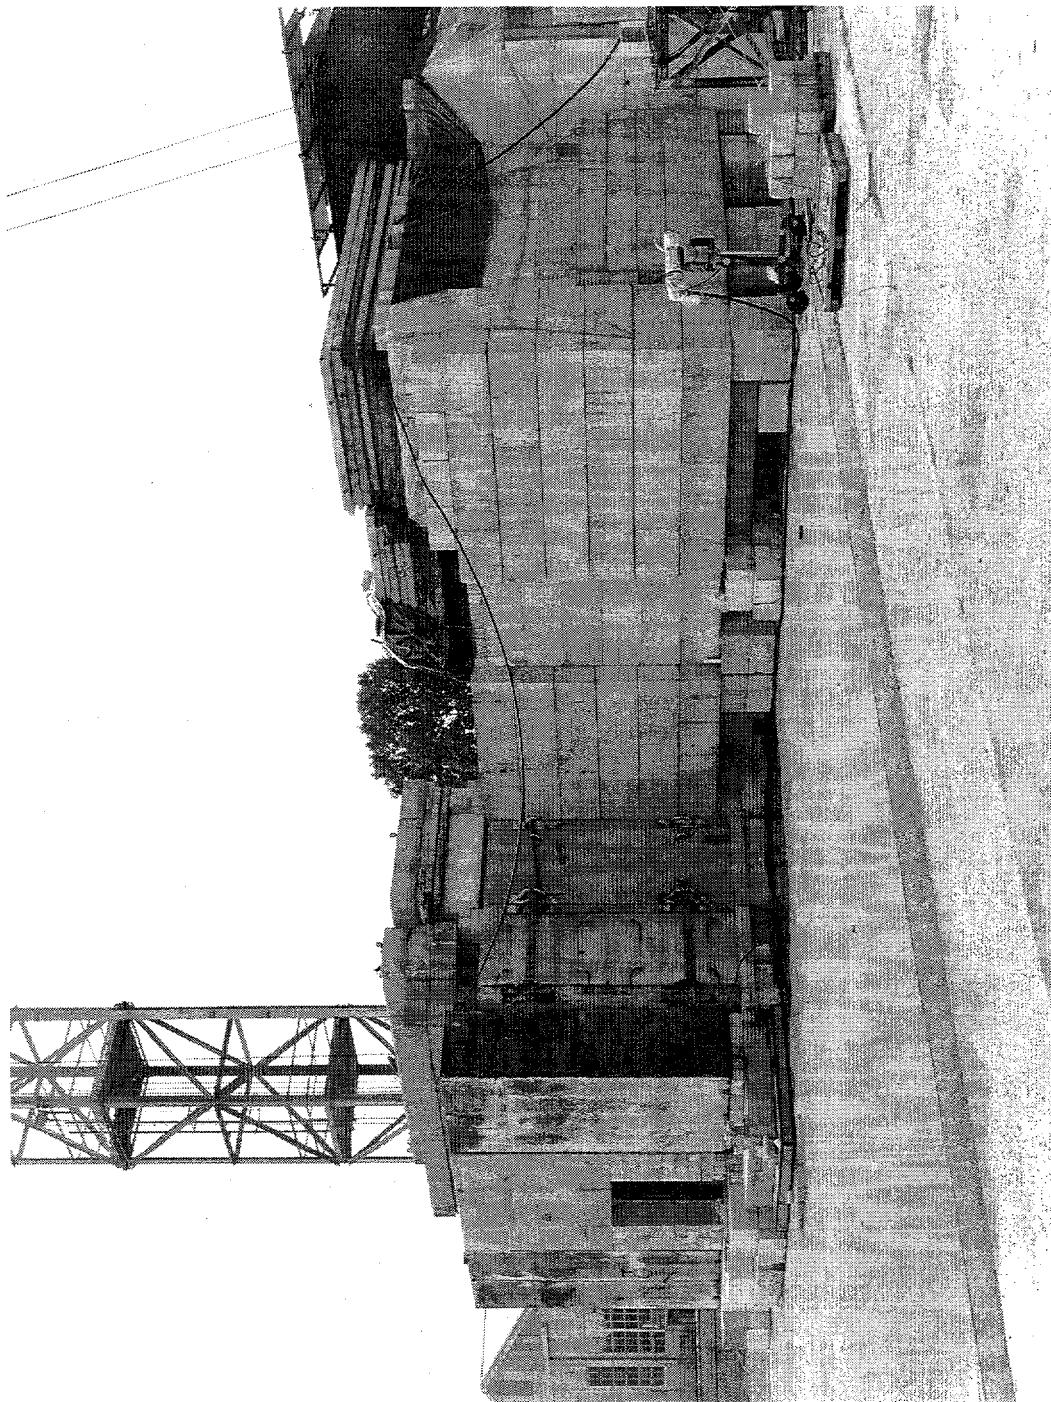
Final Arrangement of Concrete Slabs forming outside Wall of the Pipe Chaseway.
